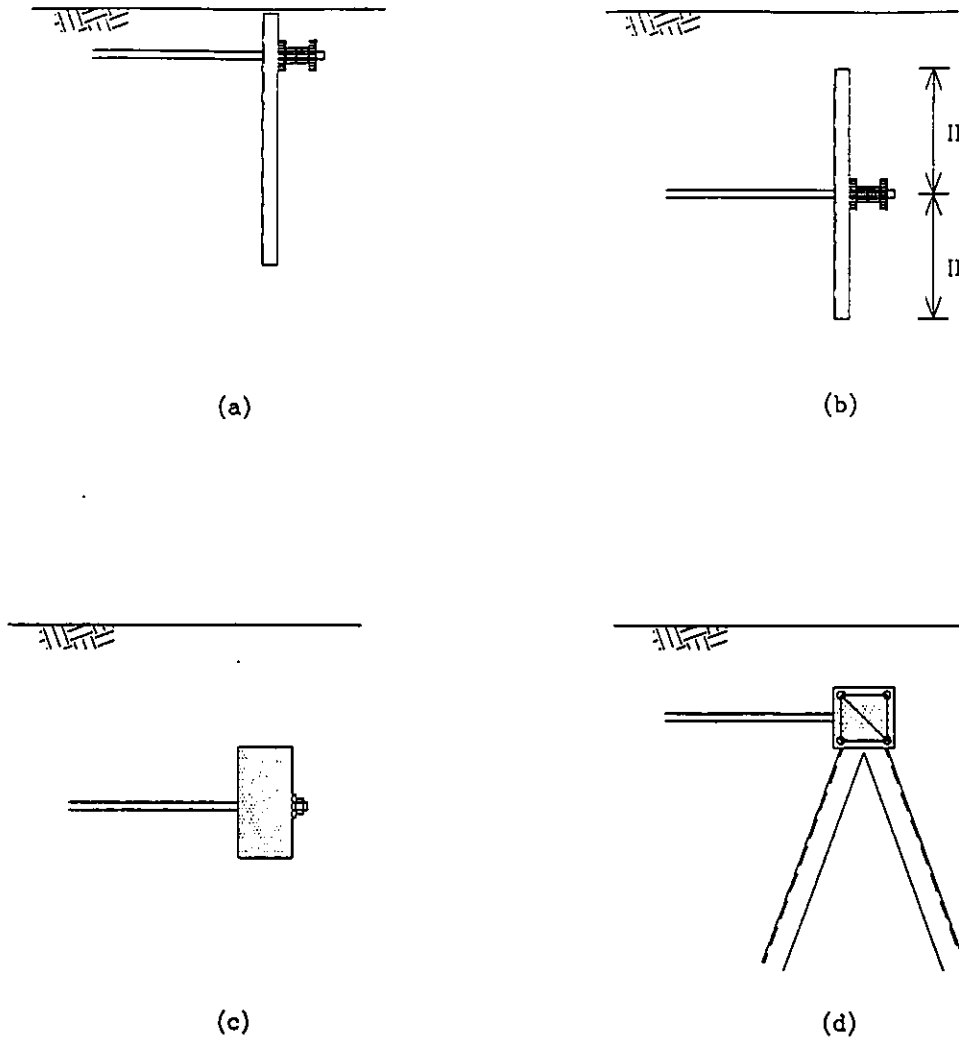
Types of anchorages: (a) cantilever sheet pile anchorage, (b) balanced sheet pile anchorage, (c) mass concrete anchorage, and (d) anchorage with raking piles.
